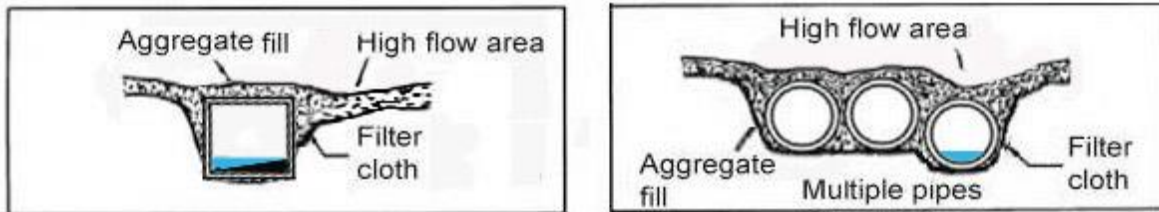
Temporary culvert crossings with box culvert and multiple culverts
